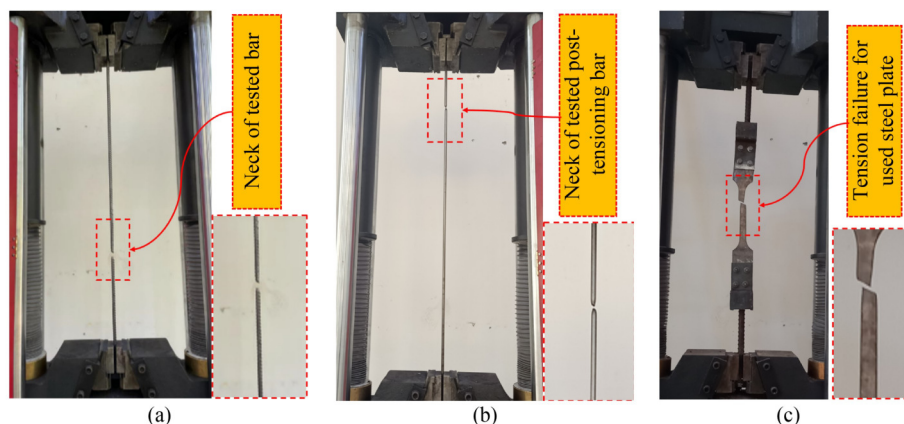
Direct tensile tests for steel elements: (a) test of steel bar specimen; (b) test of post-tensioning bar specimen; (c) test of rigid steel plate specimen.
